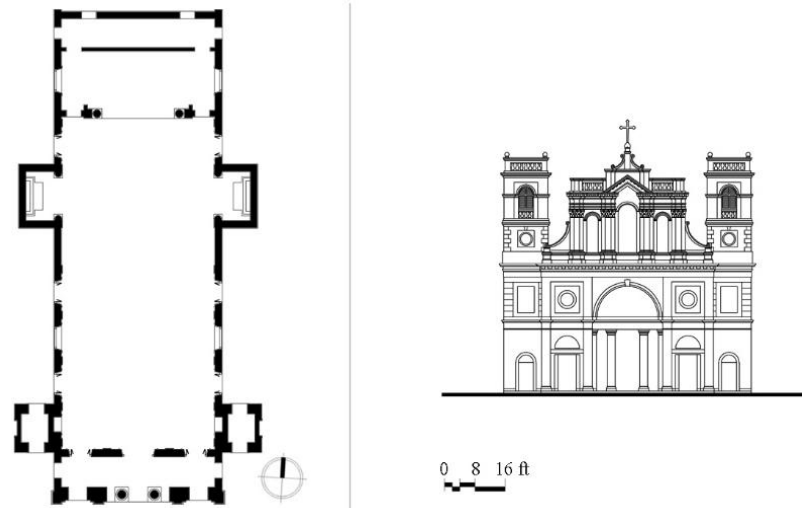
Floor plan and main façade of St. Philip Neri’s Church, Pettah
